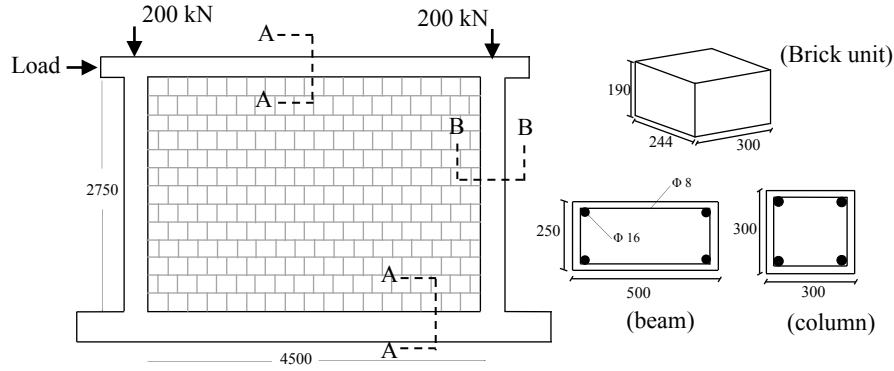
Traditional infilled frame geometric details (dimensions in mm)
